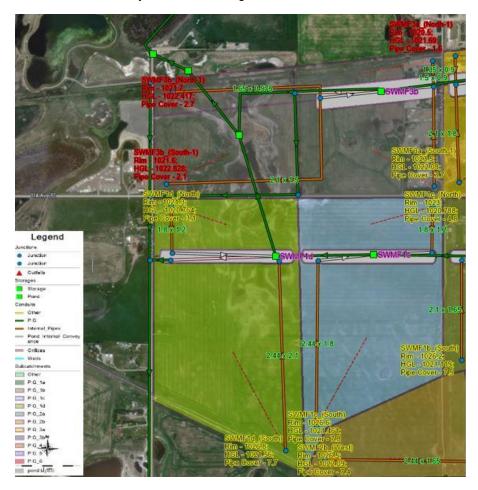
SWMF Outlet Pipes and Associated Ground Cover (Layout Section-1)
